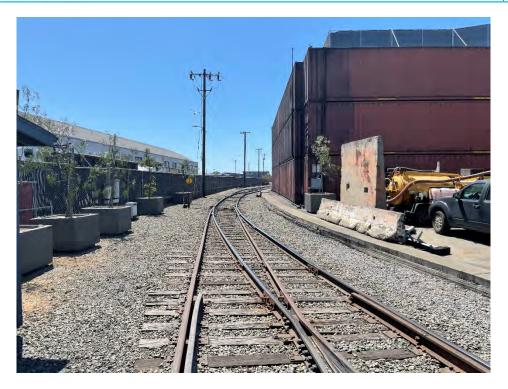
Looking south along South Fourth Street in SW-4 area. Gravel cover in good condition with no geotextile exposed.
